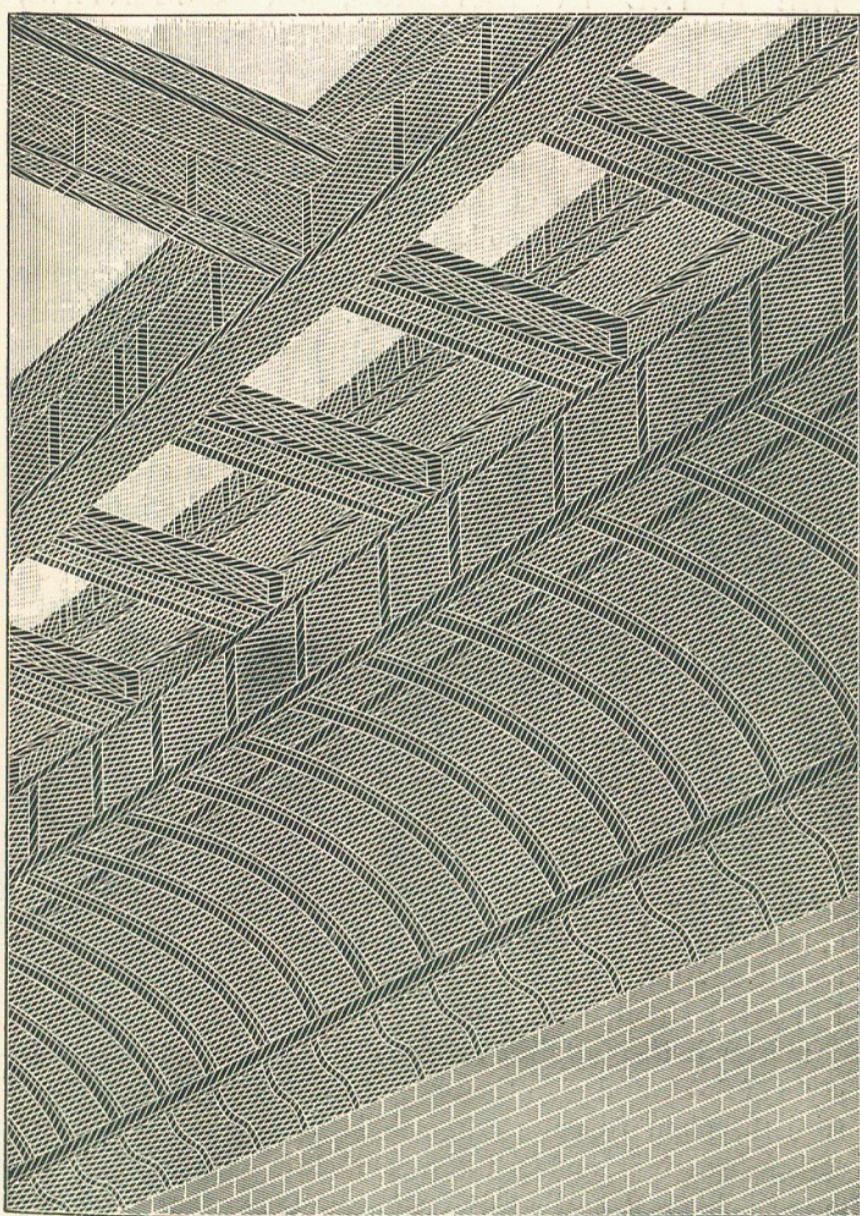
THE METAL AS FIXED TO CEILING FRAMES AND BEAMS FOR RECEIVING PLASTER.
